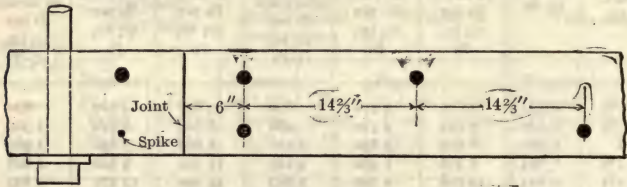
Elevation of Beam Opposite X of Fig. 25
